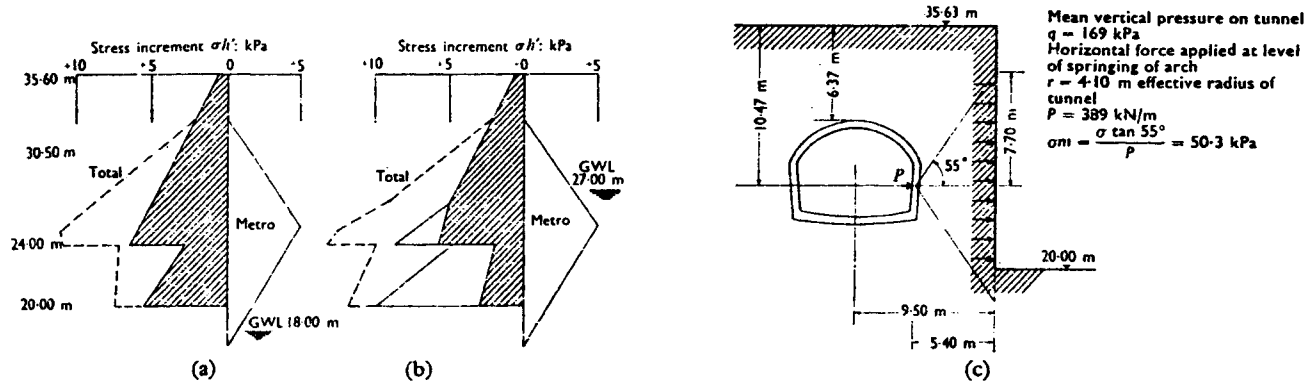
Lateral pressure distribution from metro tunnel, excavation for Beaubourg Center, Paris. (From Corbett and Stroud, 1974.)
